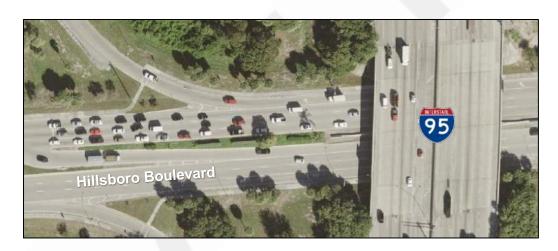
Existing Roadway Segment - Hillsboro Boulevard
